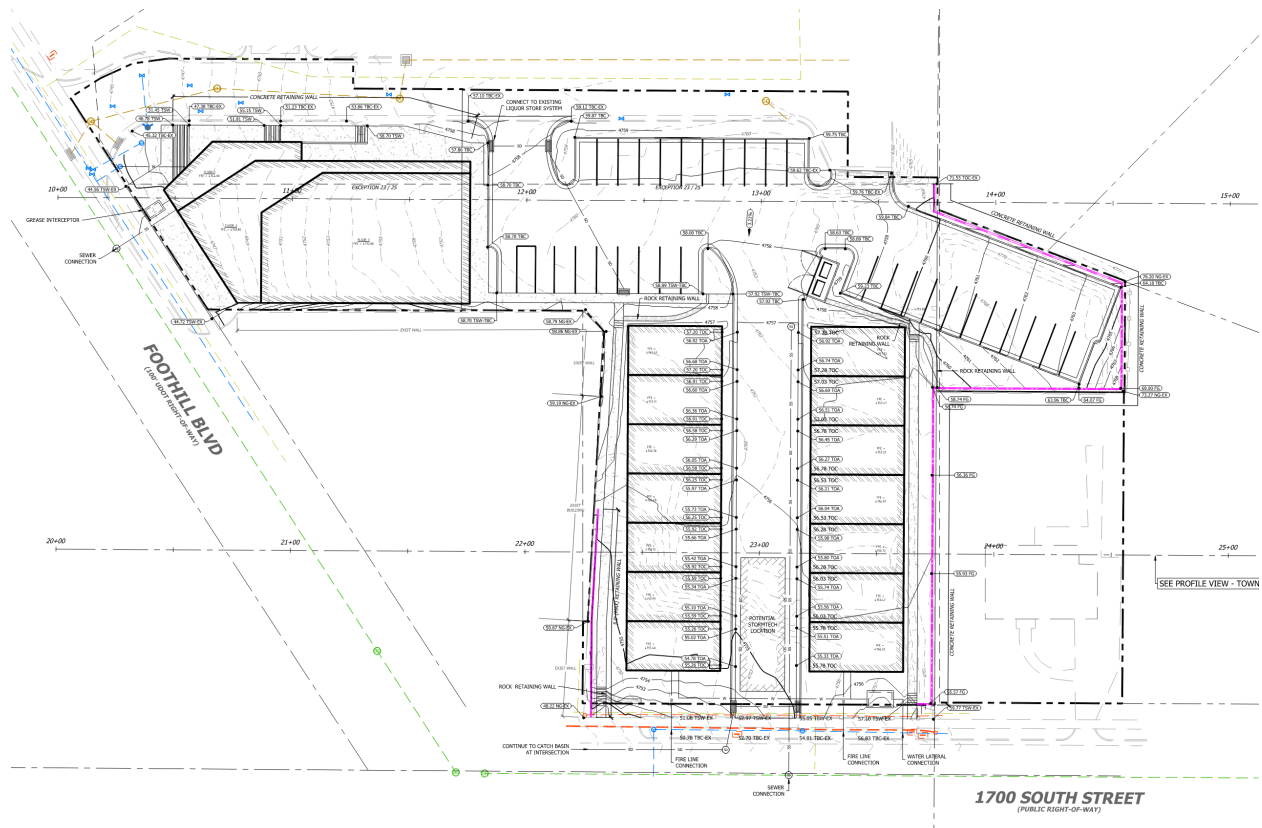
Draft Conceptual Site Plan — Lamplighter Site (subject to refinement during design review).
